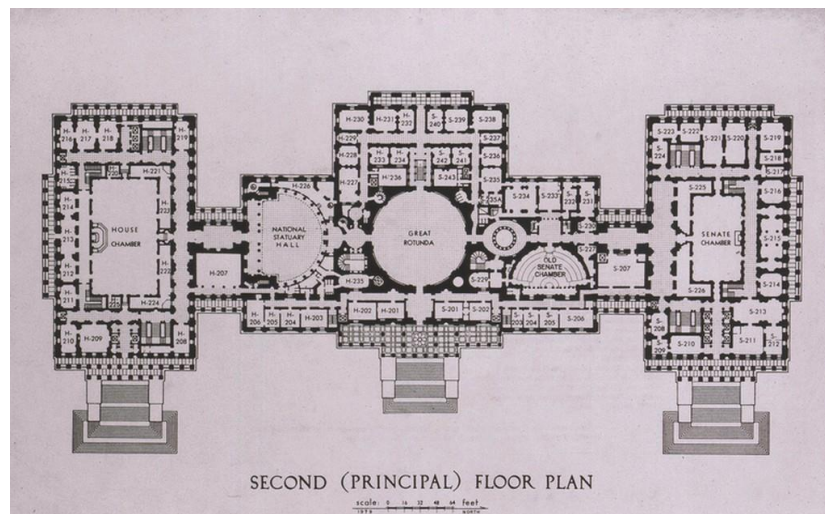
U.S. Capitol Floor Plan (ARTstor)
